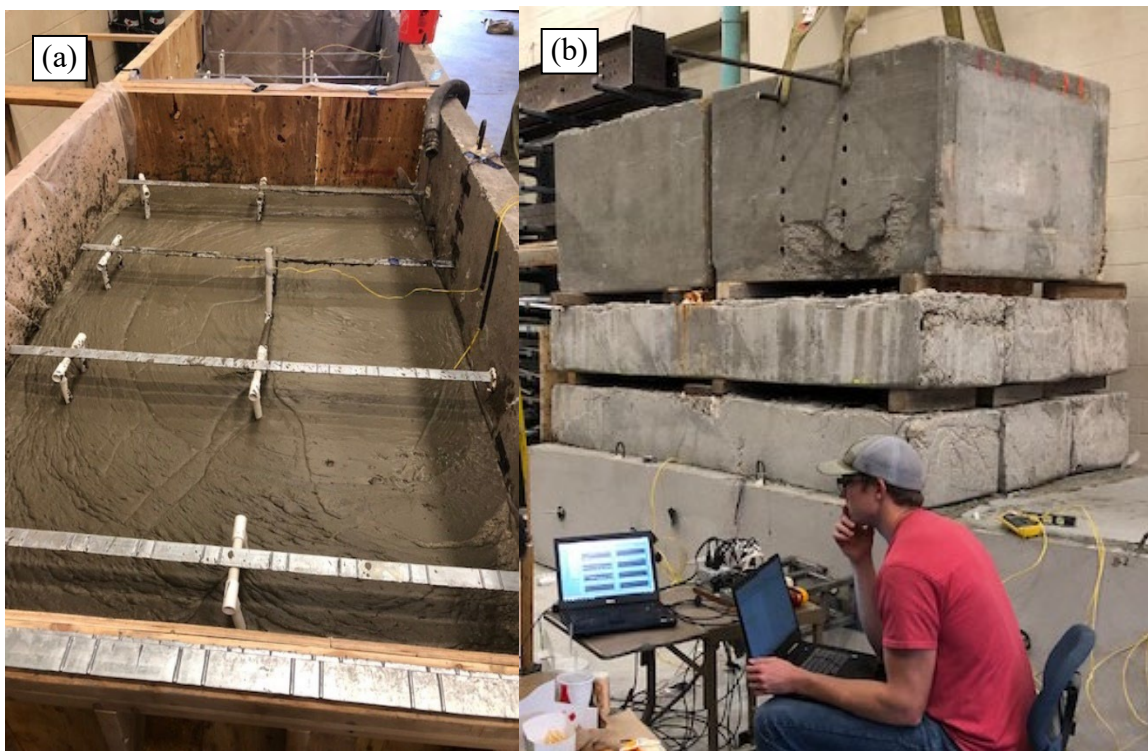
Photographs of (a) four ribbed-strip reinforcements with LCC being filled and (b) surcharge loading of LCC prior to pull-out testing.
